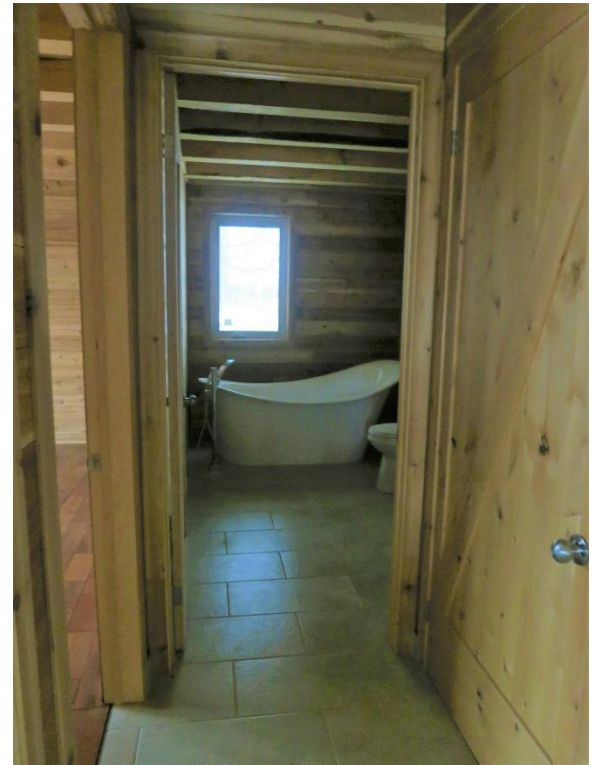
Existing accessory structure – proposed secondary dwelling unit – interior view of bathroom; to the left is the opening to a bedroom, to the right is door leading to a closet.
